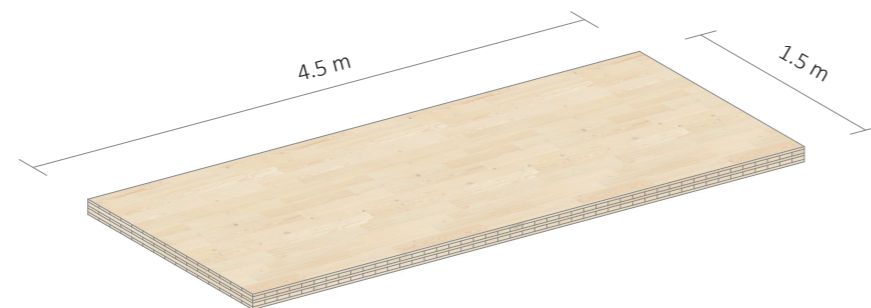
Drawing, Cross laminated timber slab element. ©Personal illustration.
